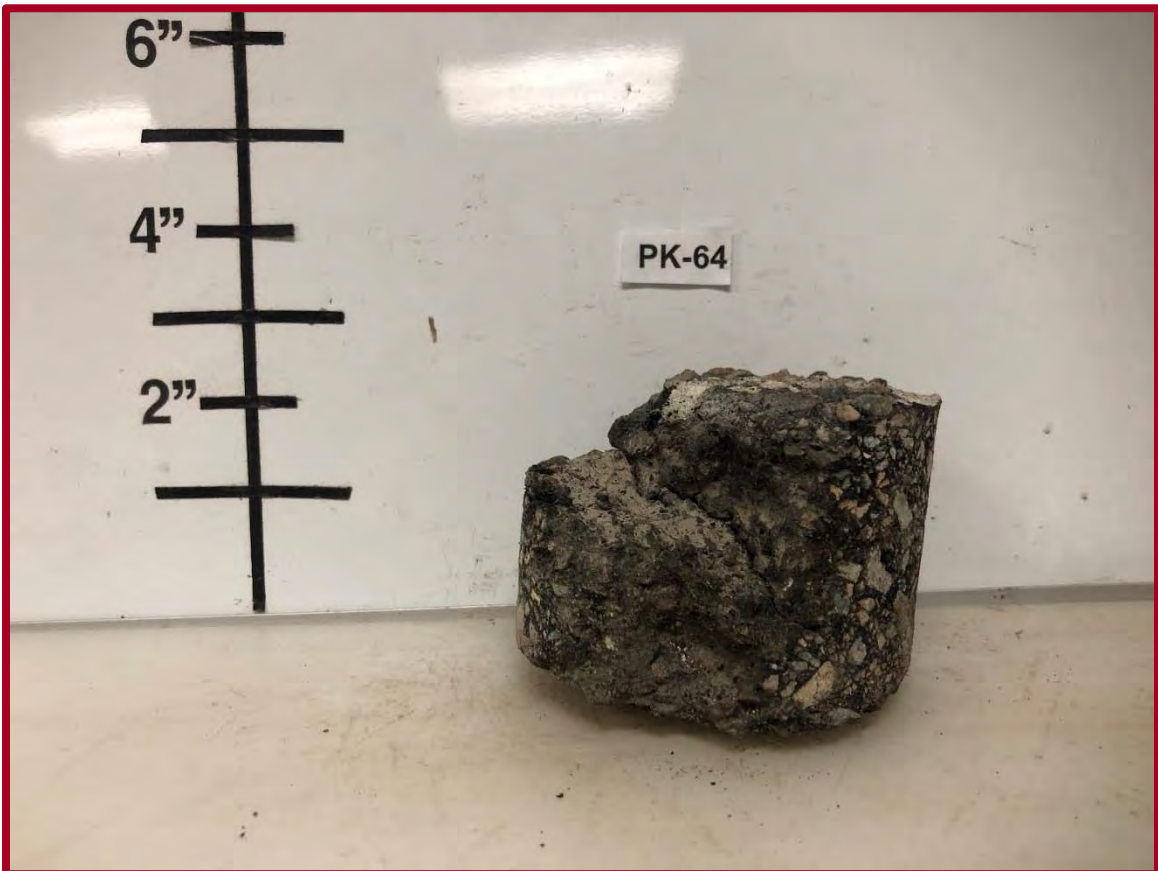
PHOTOGRAPH OF PAVEMENT CORE PK-64
